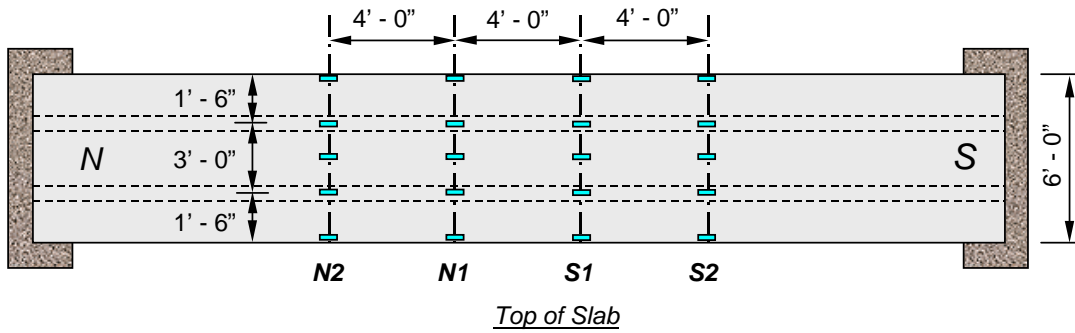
Position of Instrumented Sections for Pan-Joist Specimens
